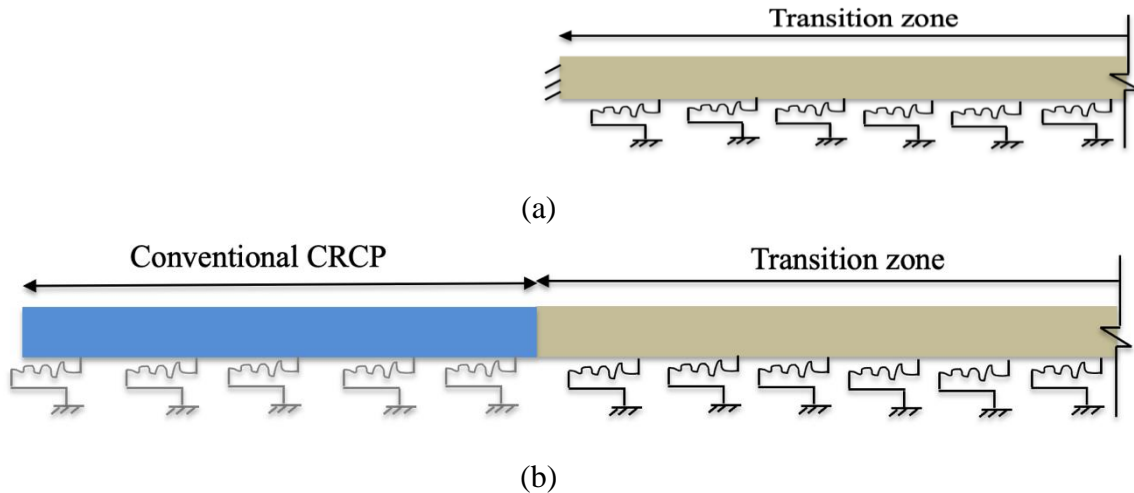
Two boundary conditions at the pavement side: (a) Transition zone with restrained translational movements; (b) Transition zone connected with CRCP.
